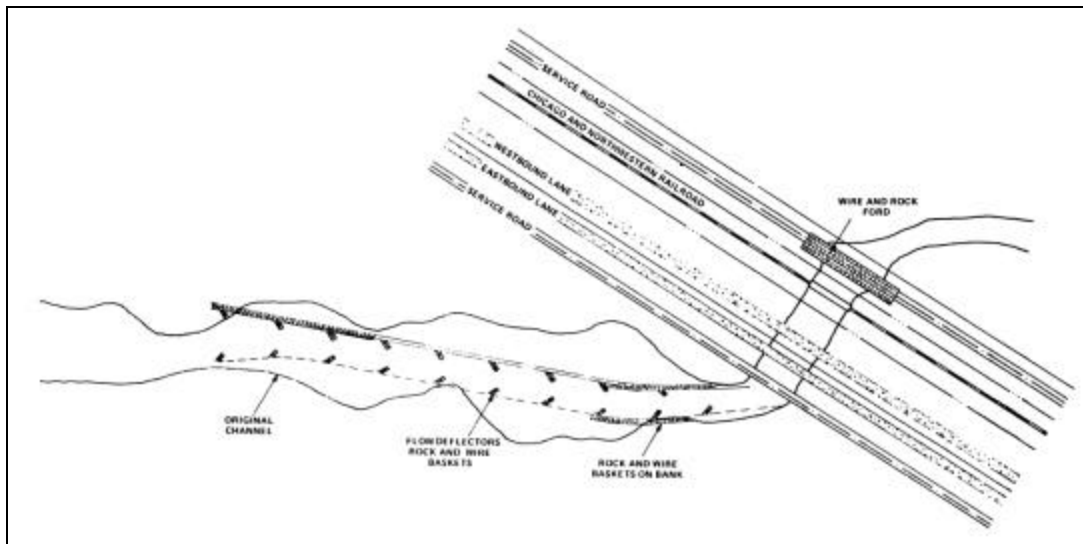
Deflector arrangement and alignment problem on I-90 Bridge across Big Elk Creek near Piedmont, North Dakota (Example 10).
